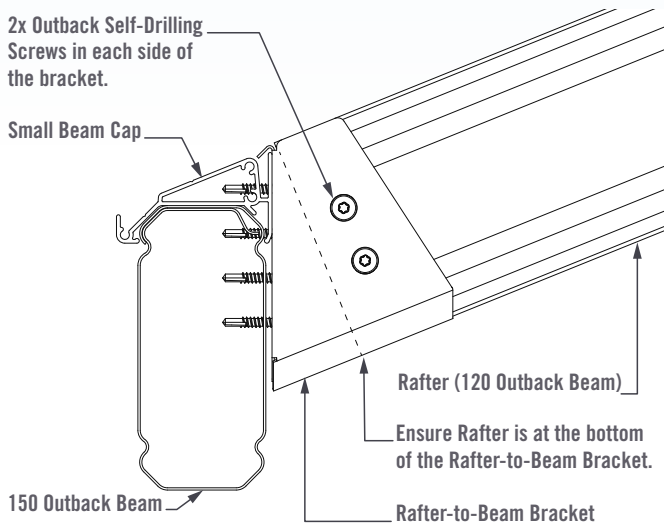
SMALL BEAM CAP - 150 SIDE BEAM - 120 RAFTER
